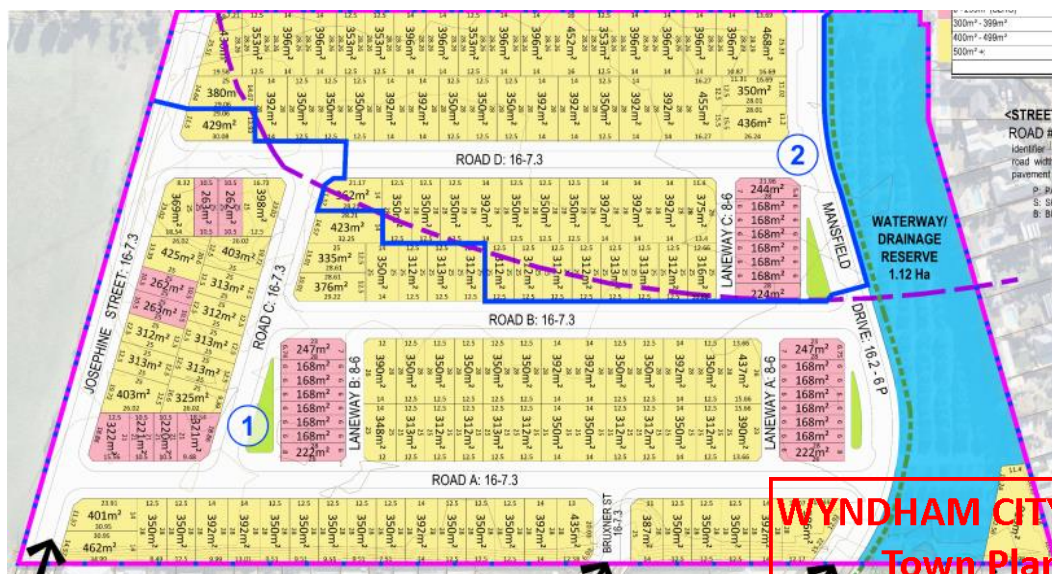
Proposed Subdivision Masterplan (Taylors 2022)
